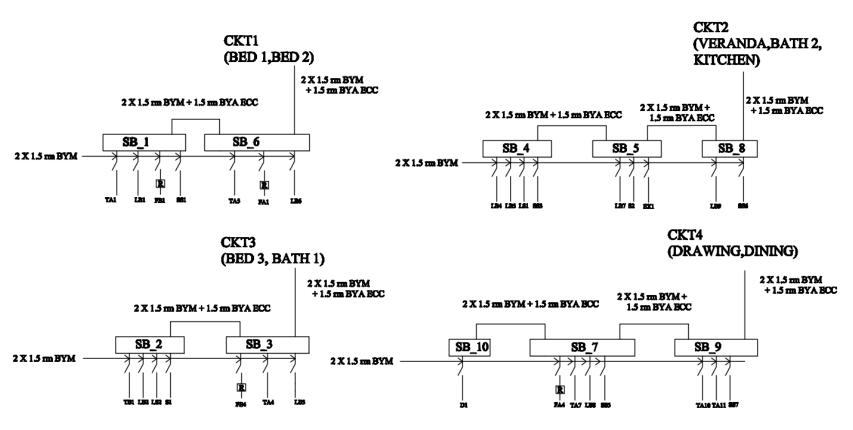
Switch Board Connection Diagram (Per Unit General Floor)
